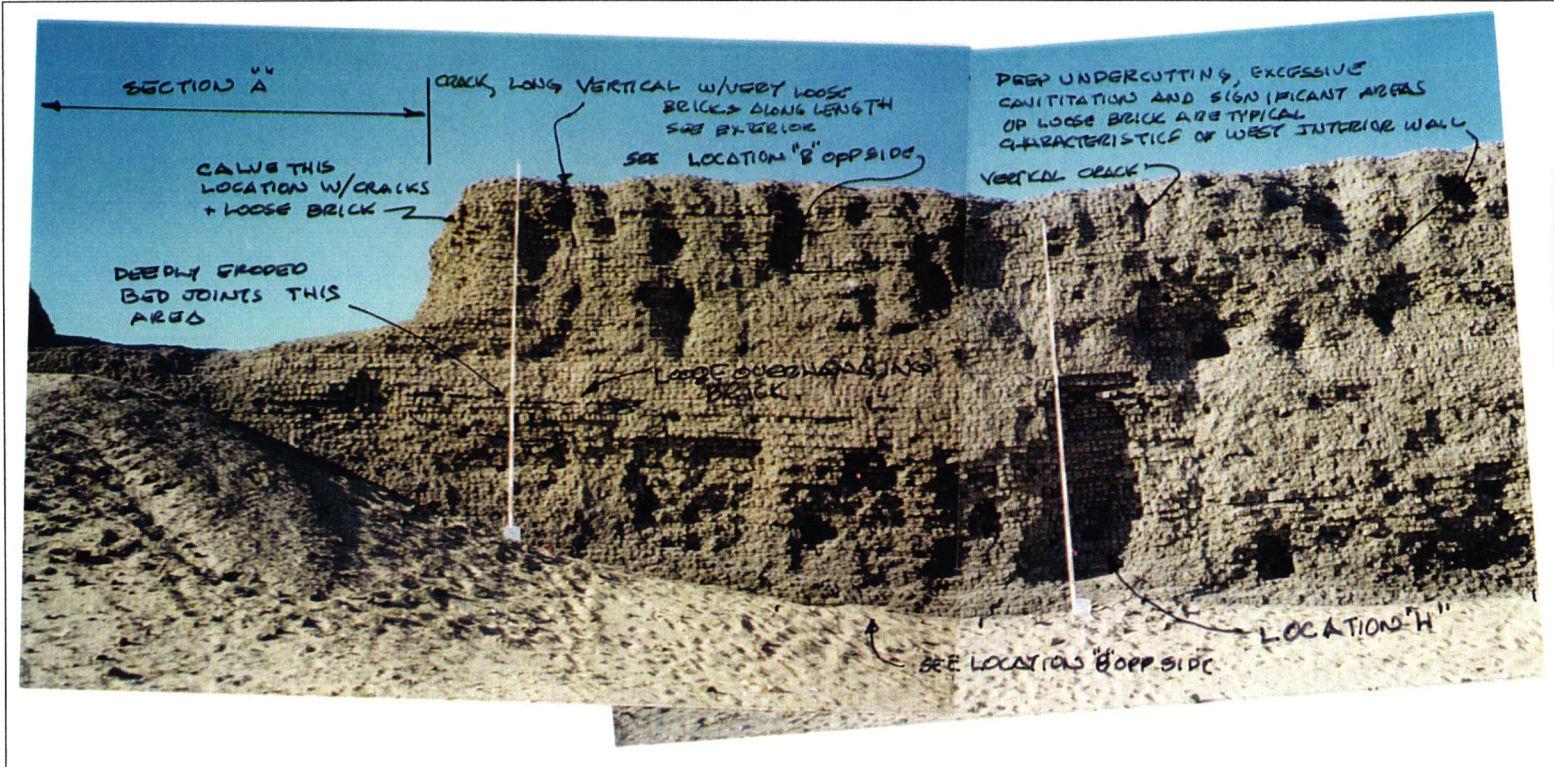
West Main Enclosure Wall South End Lower Surface
